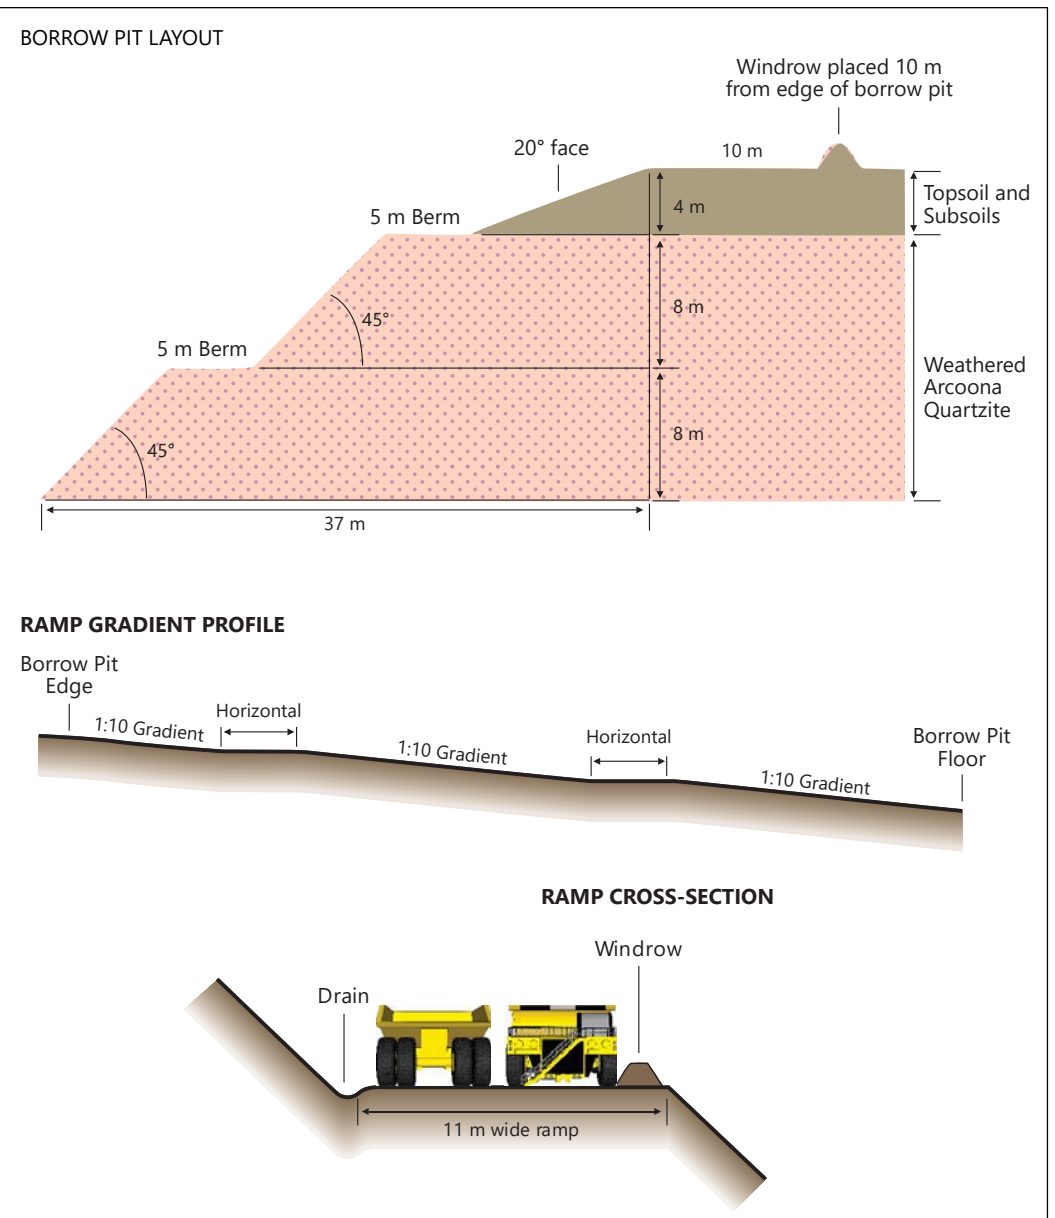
Mine Area Borrow Pit Layout and Cross-Section
